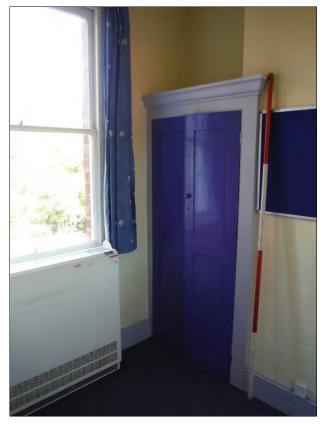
Detail of cupboard on the north side of the chimney breast in Room F13 (Scale = 2m).
